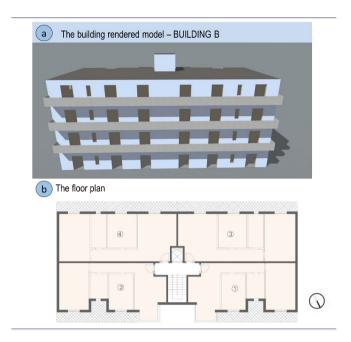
The four floors building: a) Rendered view of the building, b) Indoor distribution of an intermediate floor
